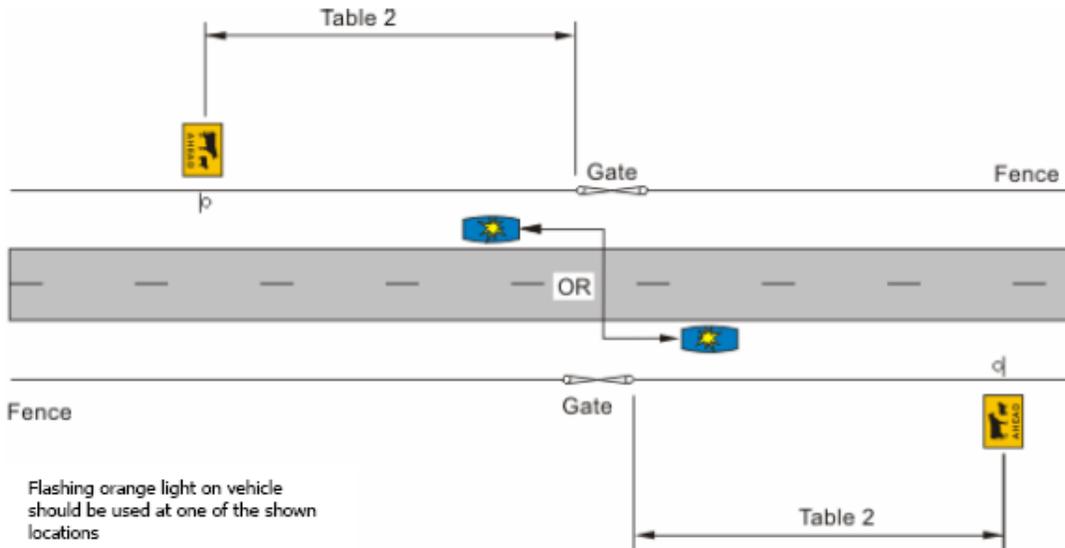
Typical Stock Crossing Site – for bitumen roads.
